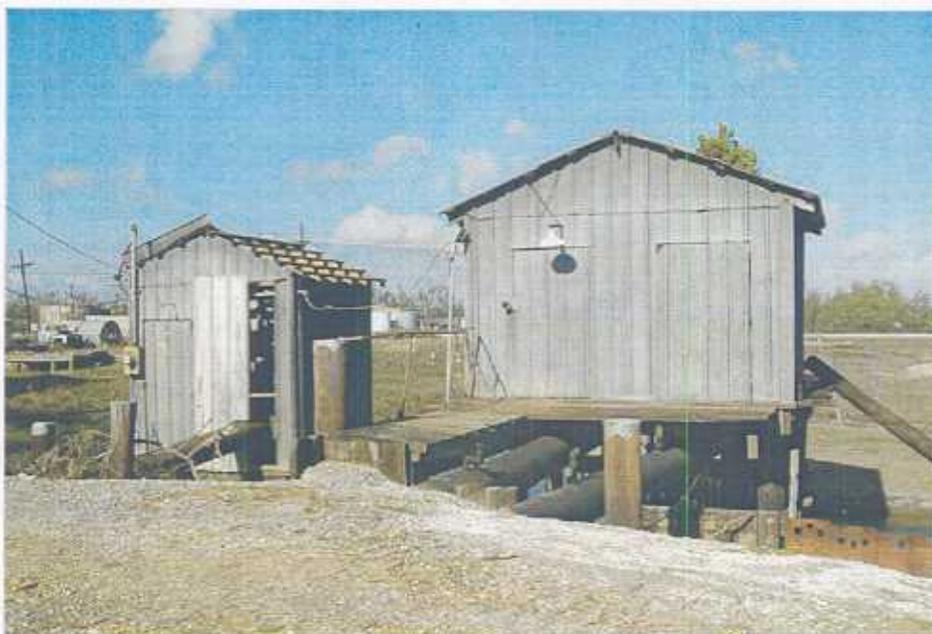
Pointe A La Hache West Bank Pumping Station - Intake
